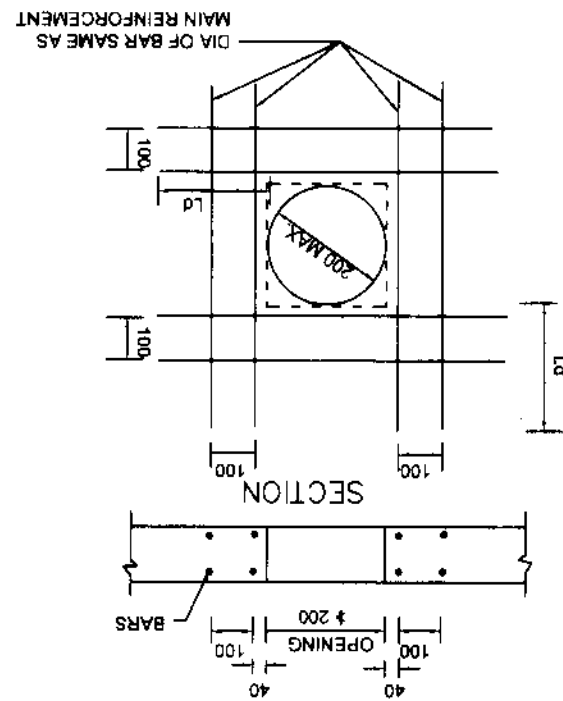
FIXING DETAILS OF PIPE EMBEDDED
